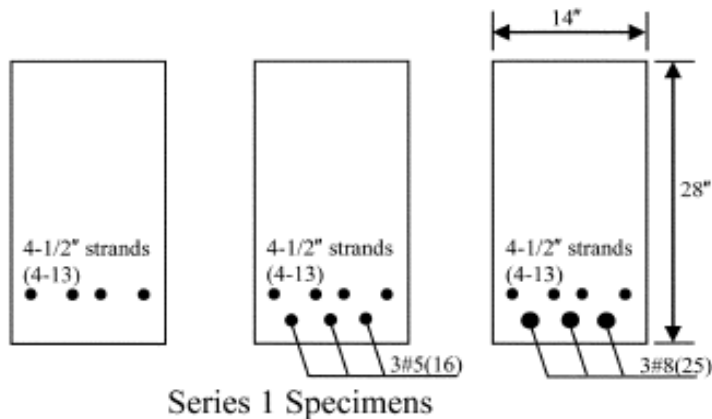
Test Beam Cross-Sections (Saqan and Frosch 2009).
